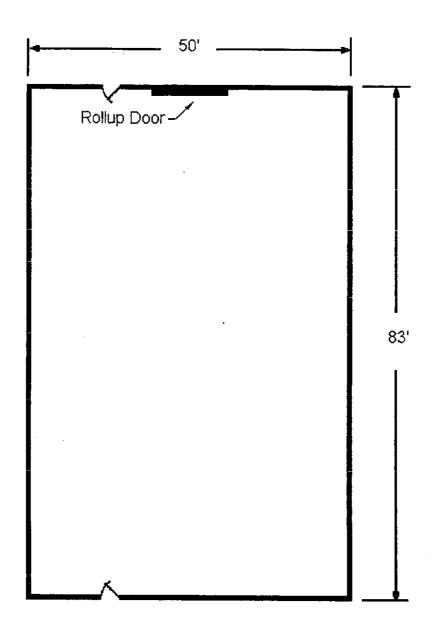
NFS TRU Storage Facility, Building 7574.
